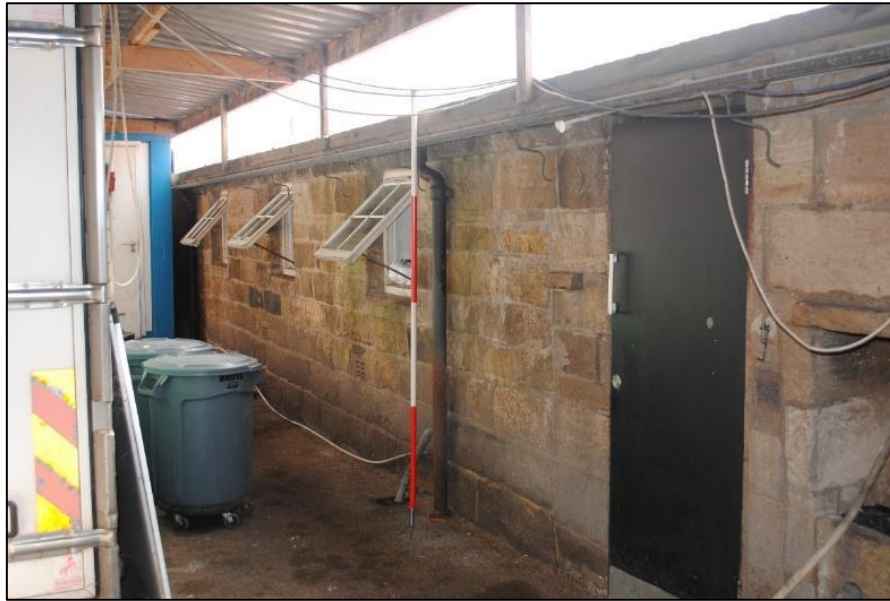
Kitchen extension (K1) east wall; view SW; interpreted as re-use of older stonework
